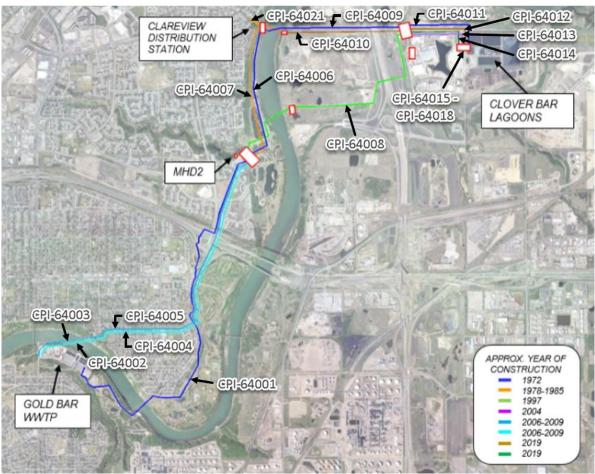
Sludge / Supernatant Pipe System Layout
